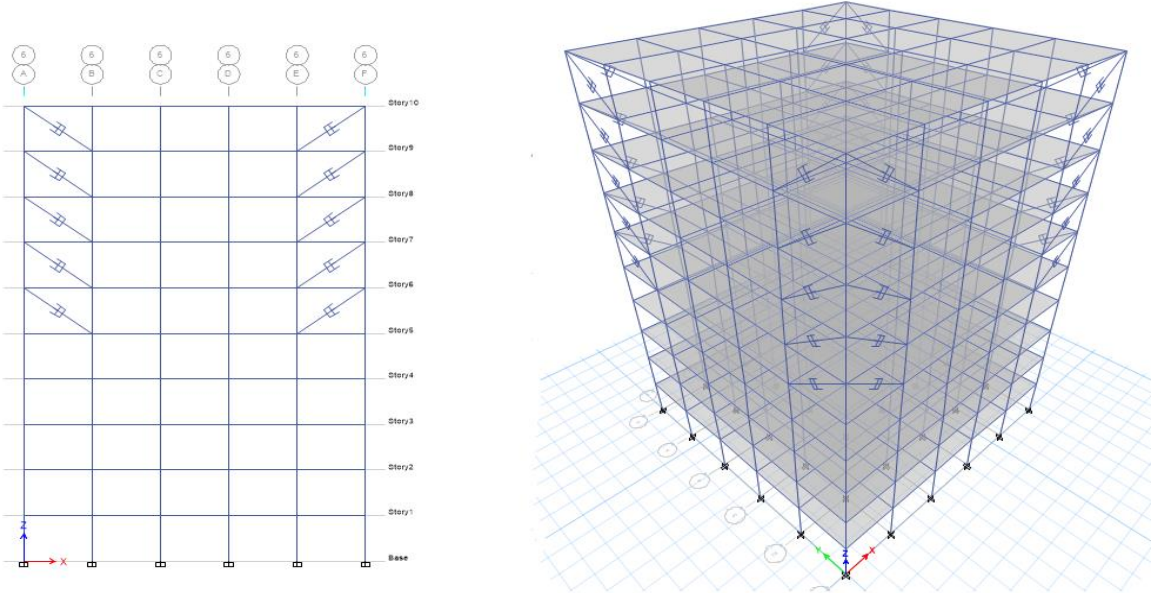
RC bare frame, dampers at corner, in top half storeys (BDCTH)
